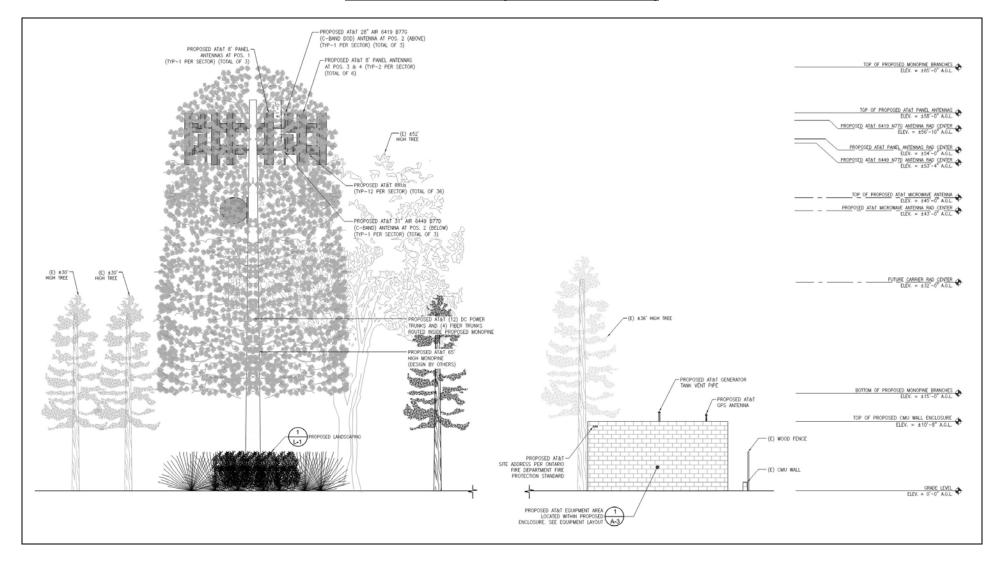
Exhibit D: ELEVATIONS (EAST - CONTINUED)
